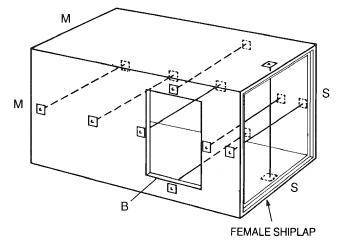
REINFORCEMENT OF ACCESS DOOR FRAMING
